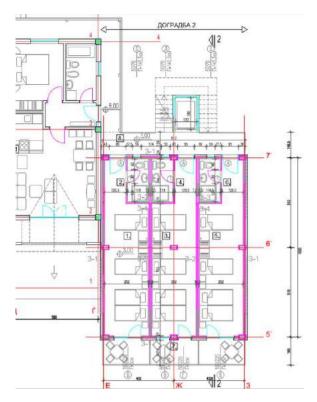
Design of the first floor in extension/addition to existing accommodation facility
